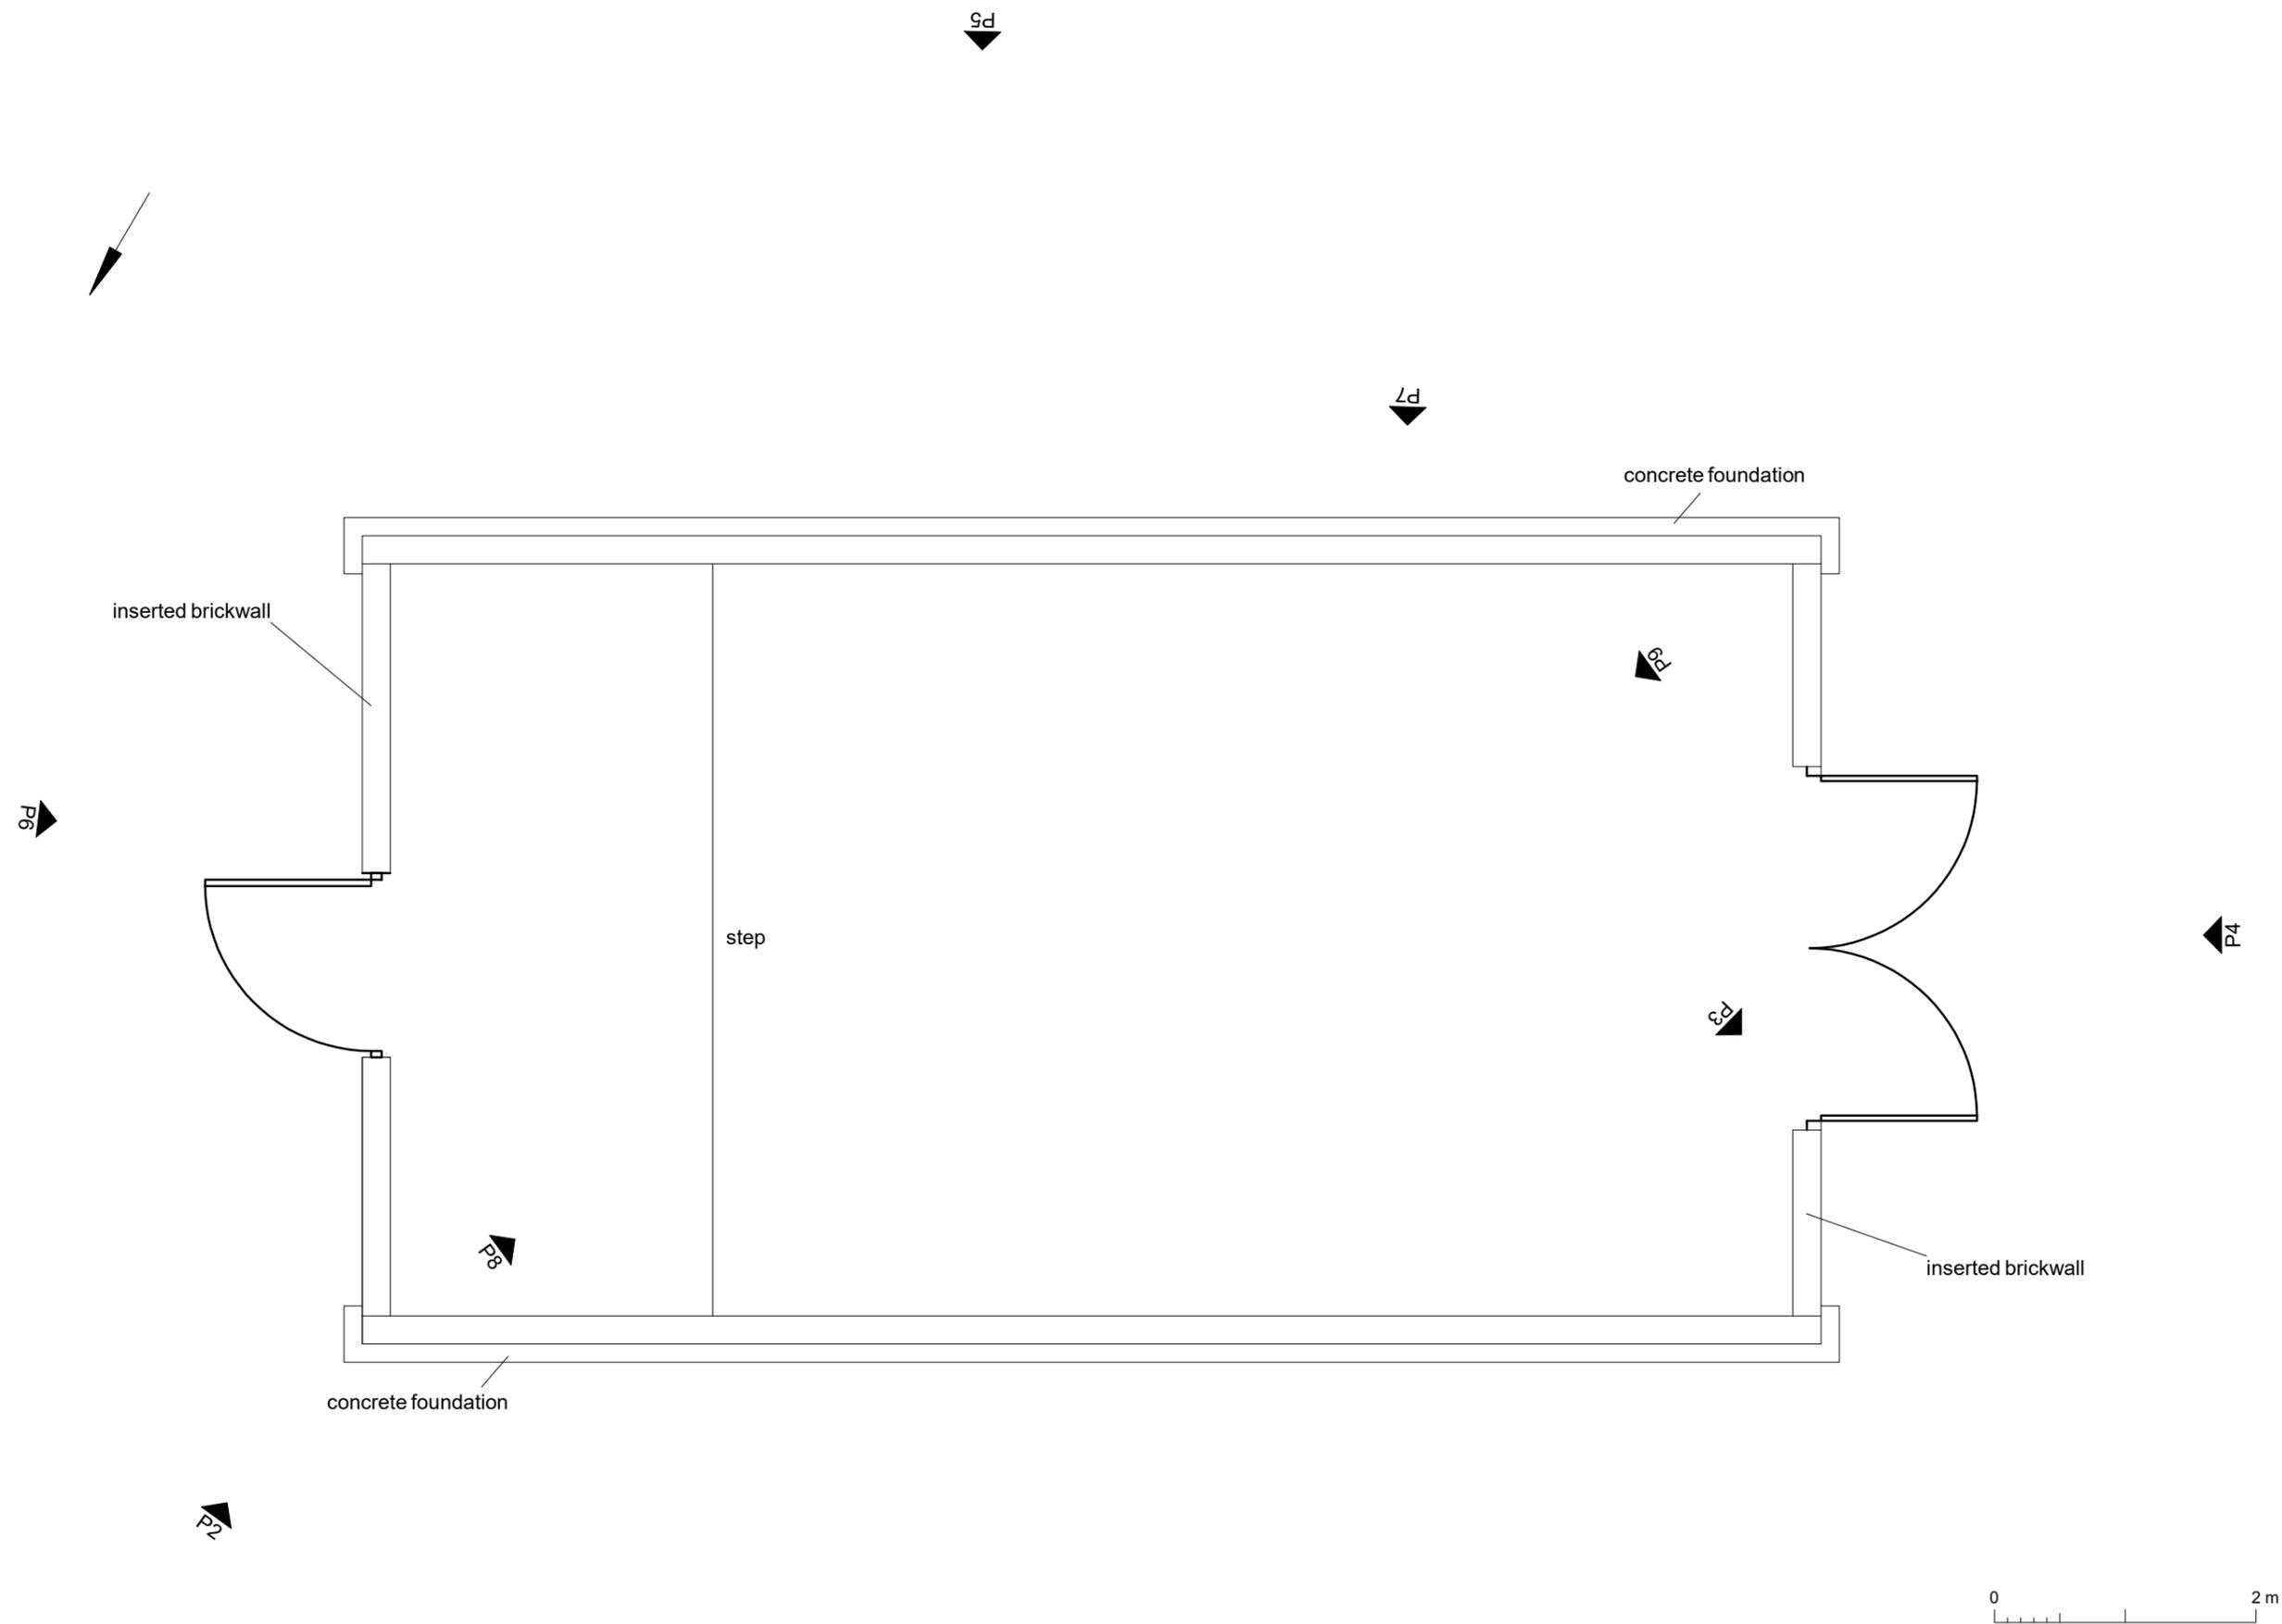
Handcraft hut floor plan. Location and direction of photographs reproduced in the text shown.
